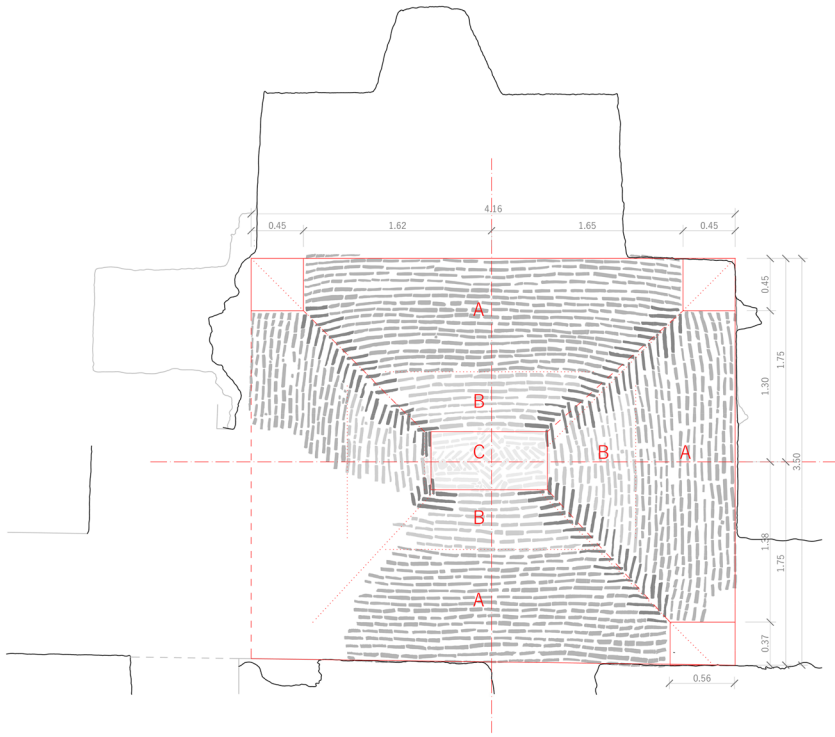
Plan of the vault showing brick arrangement and layout of segments A, B and C
